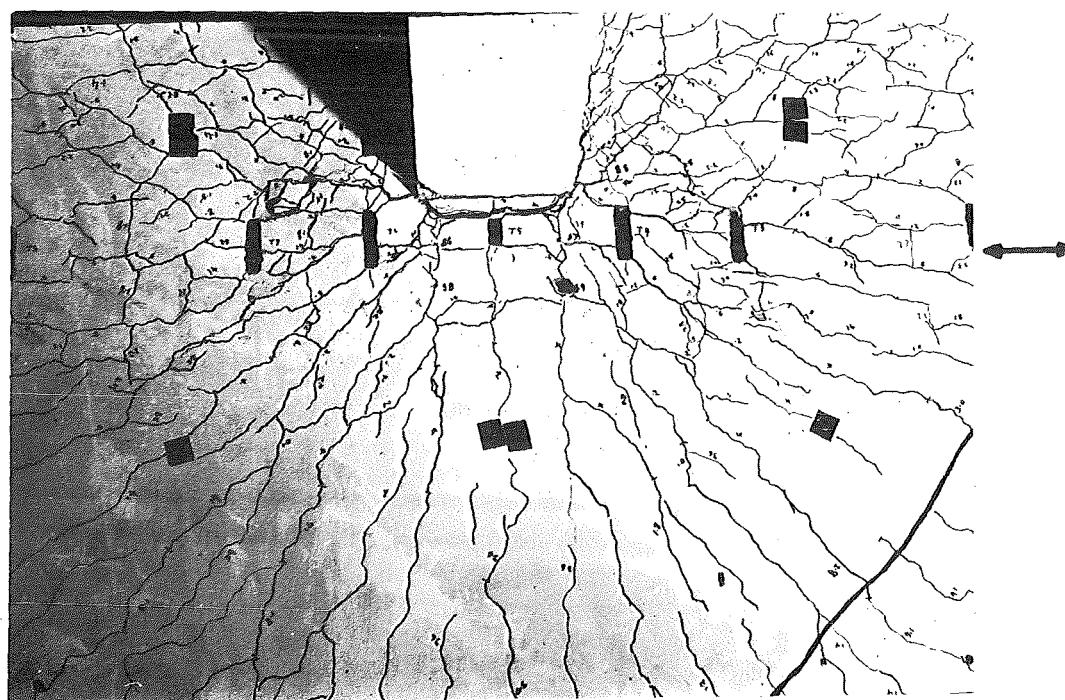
CRACK PATTERN OF SPECIMEN 6CS
